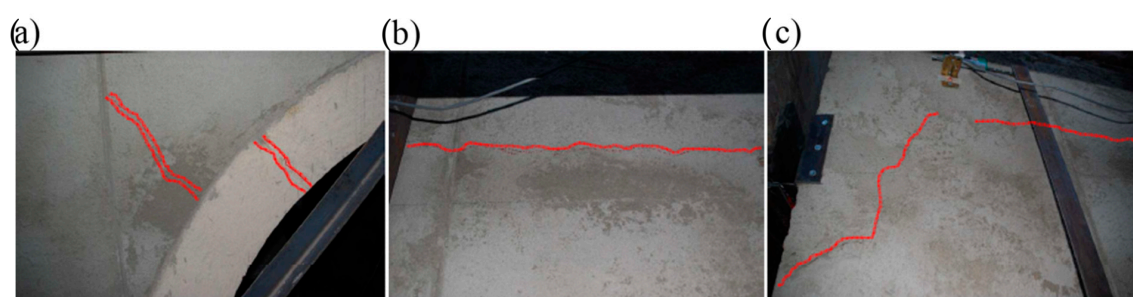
URM wall cracking: (a) left pier above the opening; (b) horizontal spandrel on the top; and (c) near the loading point.
